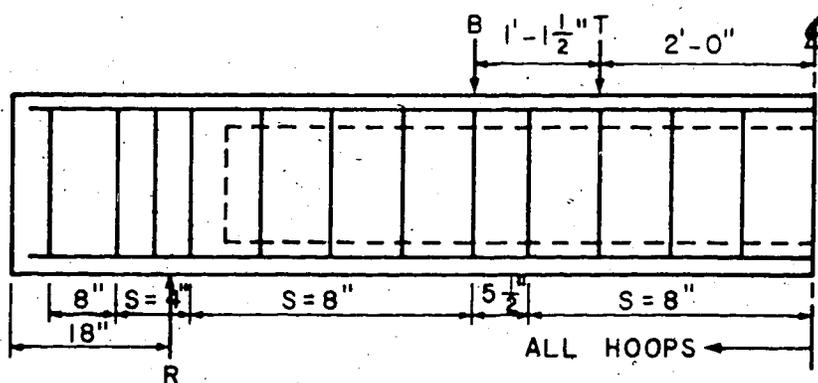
(C) REINFORCEMENT FOR BEAMS T1 AND T2
